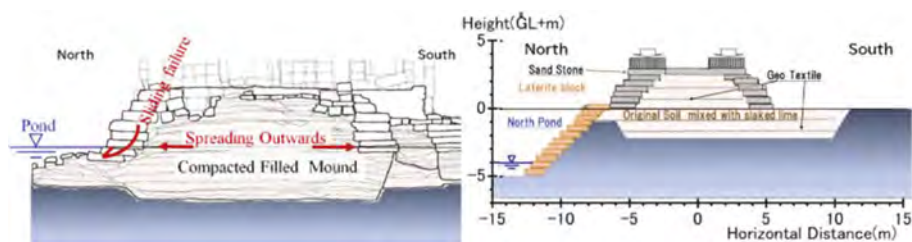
(a) Trenched section of N1 tower. (b) Restoration of foundation of N1 tower.
